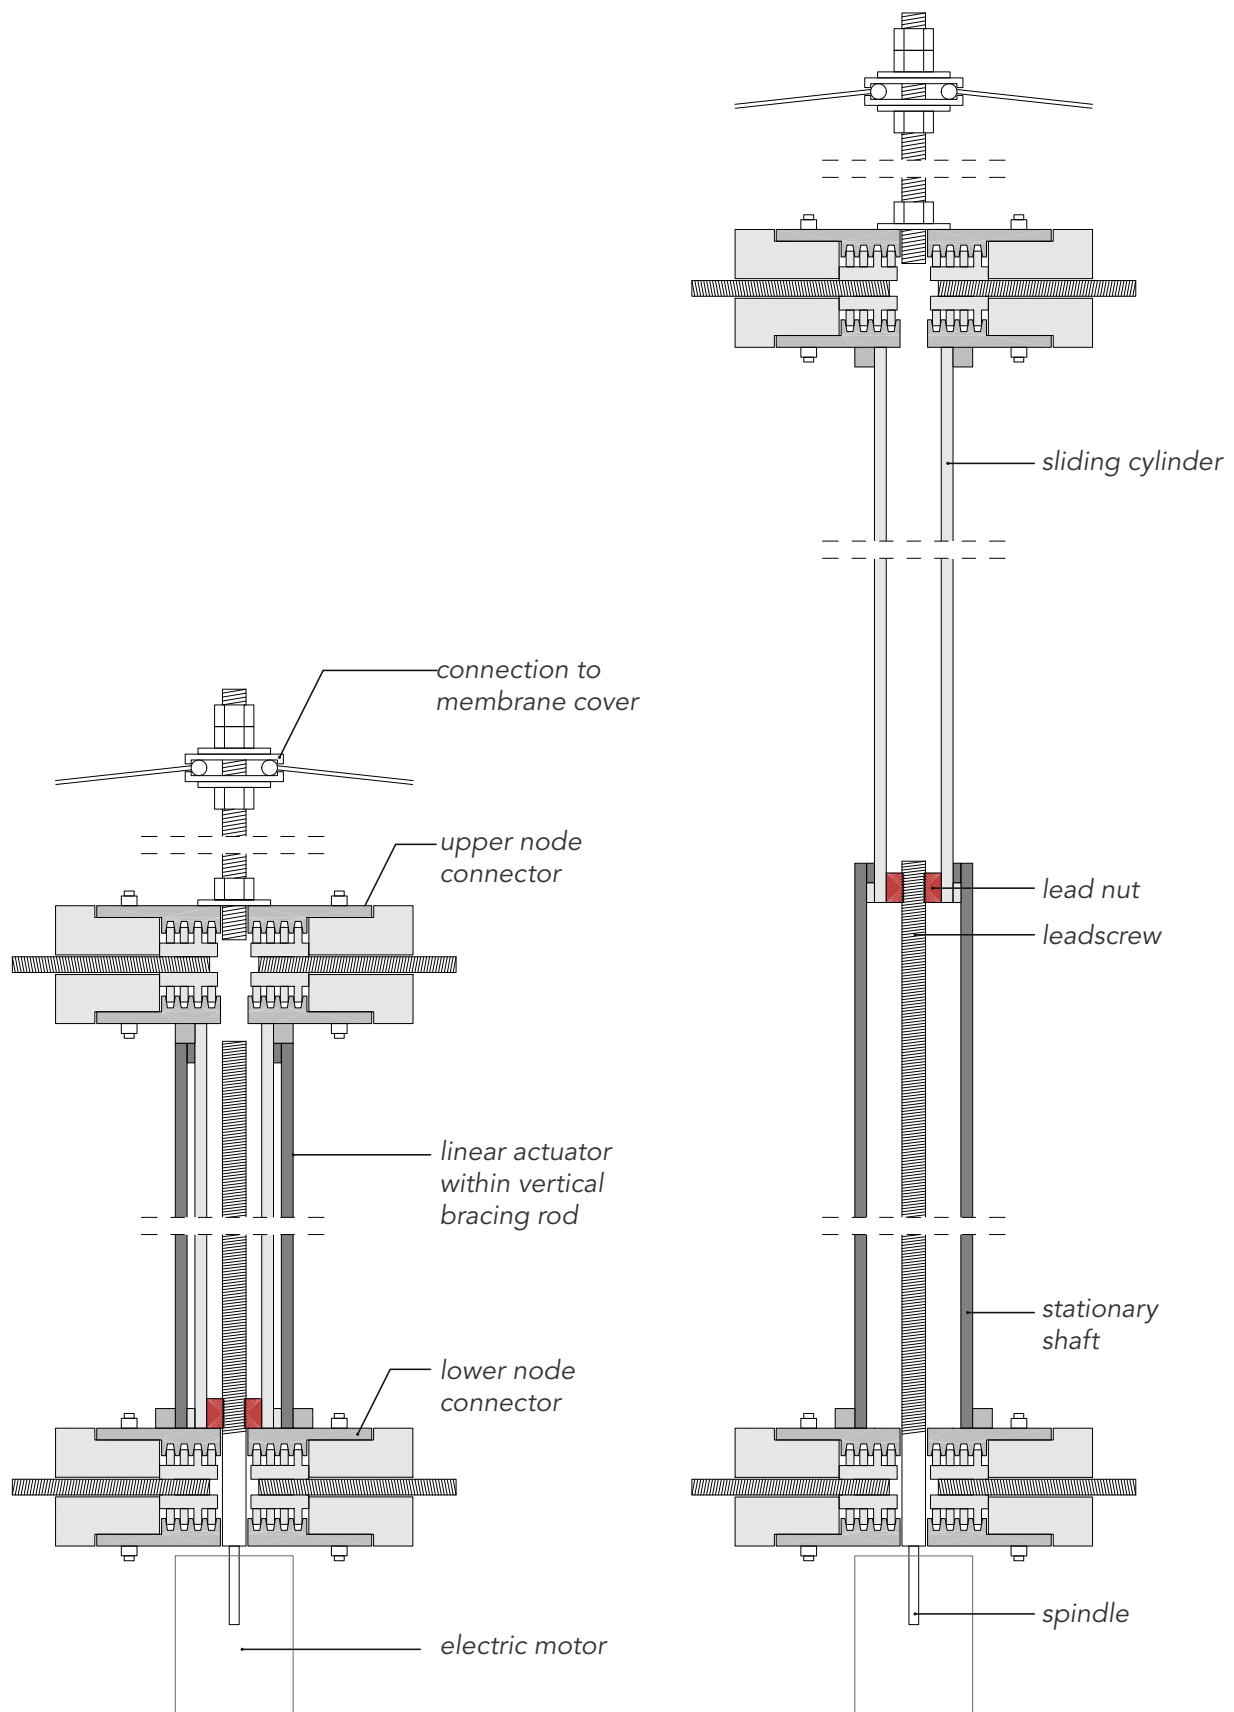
Section drawing through vertical bracing rods containing a linear drive system.
